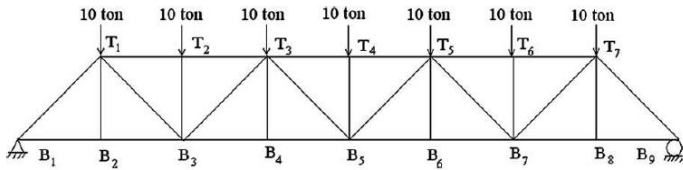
Assumed dead load defined in joint location in Louisville Bridge Source: [3]
